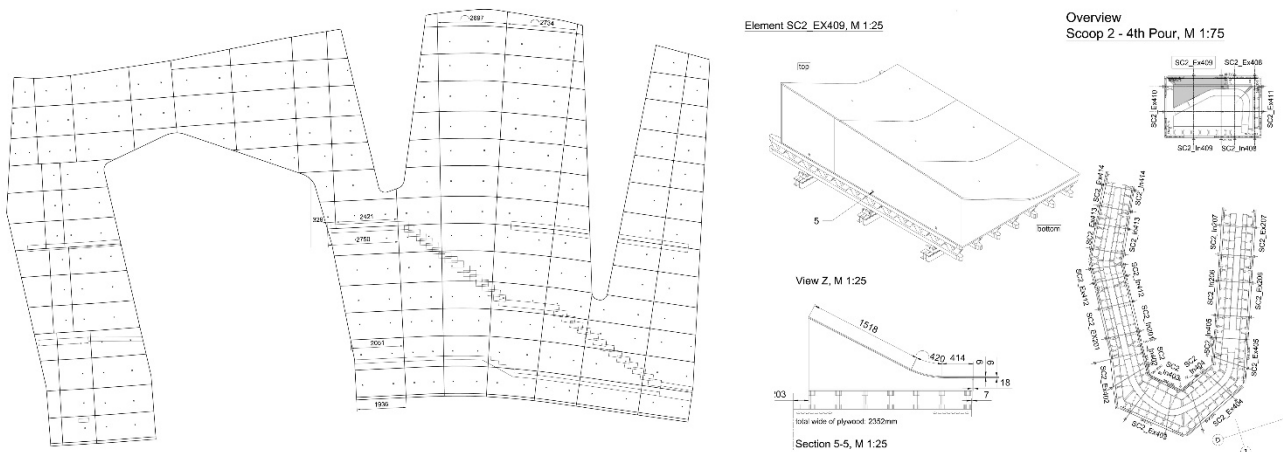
Unrolled scoop elevation (left), and formwork shop drawing detail (right) (PERI).
